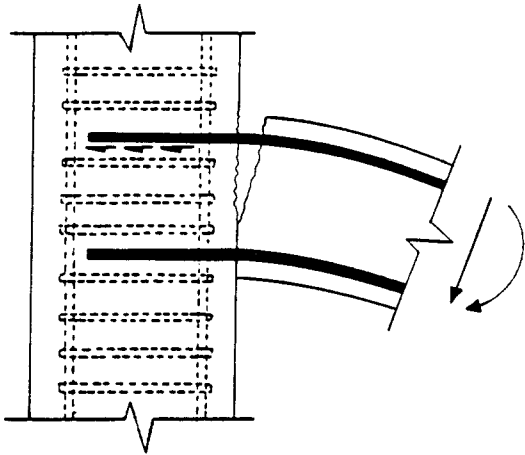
Anchorage of Beam Reinforcement at Exterior Joints
